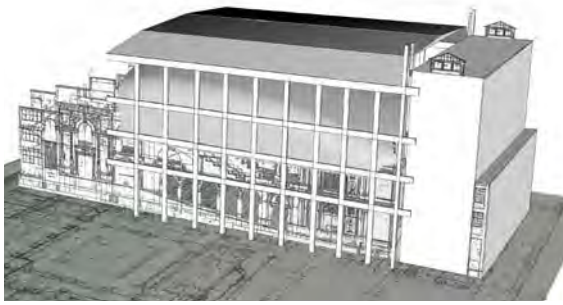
Digital montage of structural system of Capitol theatre, plan highlighting facade dominant
